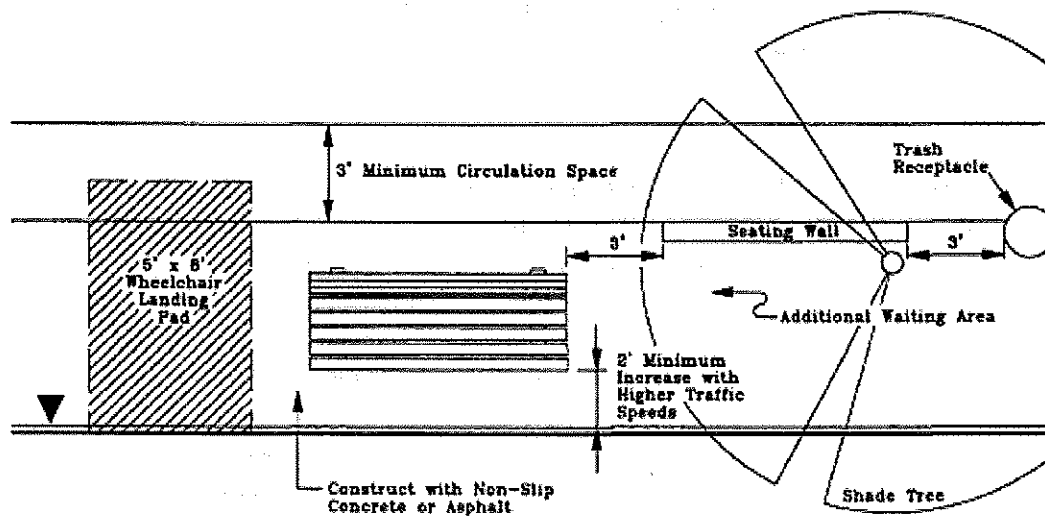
Conceptual Bench and Waiting Pad Design
